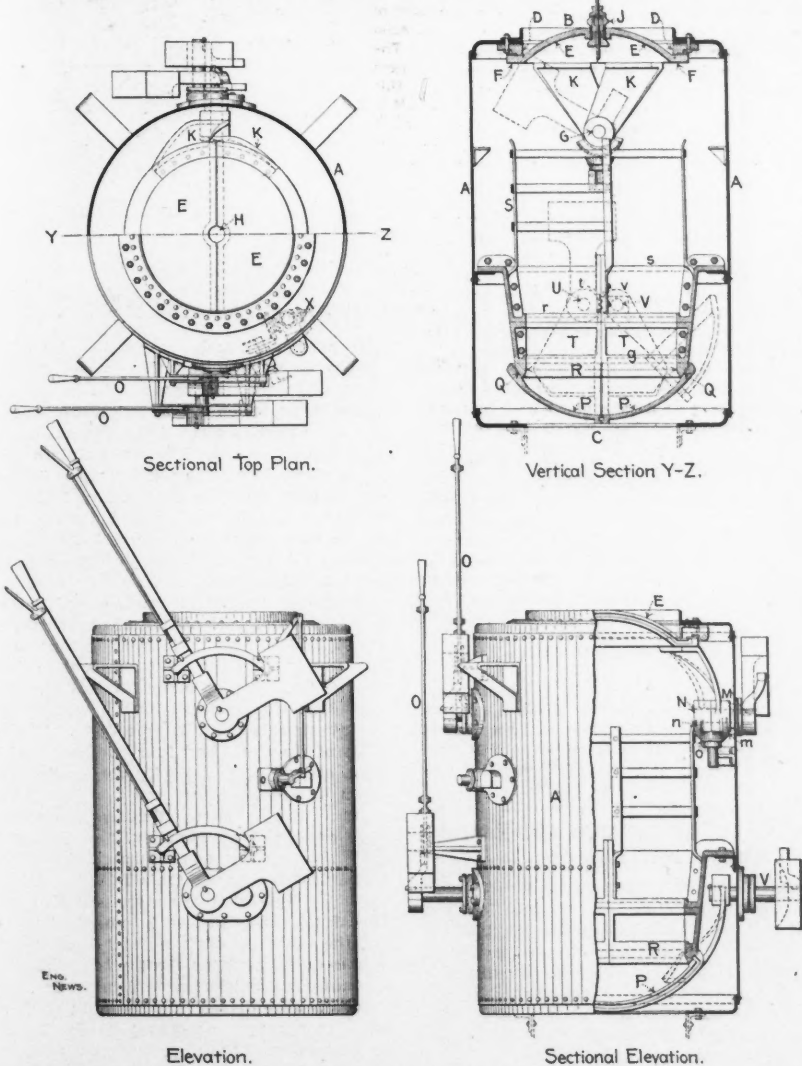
PLAN, SECTIONS AND ELEVATIONS SHOWING CONSTRUCTION AND OPERATION OF AIR LOCK.
